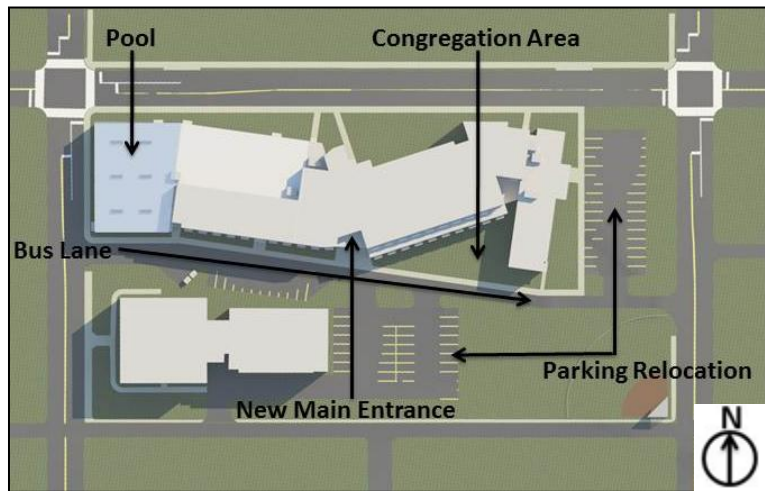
Nexus' Revised Campus Plan (building moved east, parking reallocated, and pool addition)
